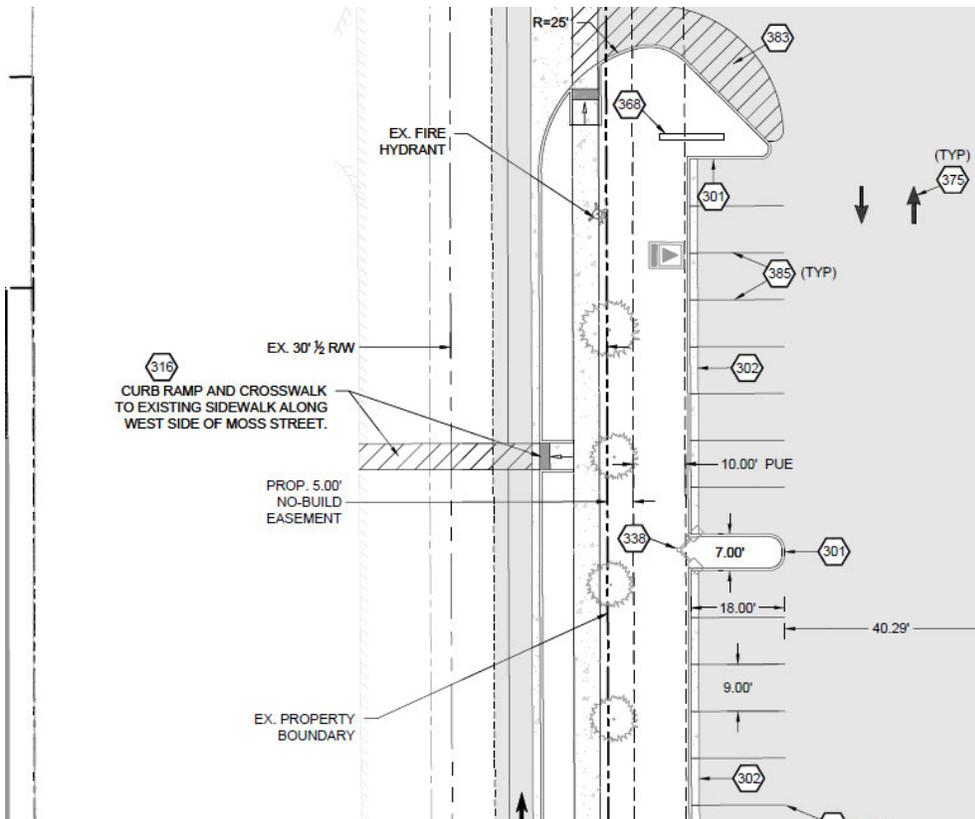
To address pedestrian safety, applicant will be constructing a pedestrian crosswalk across North Moss Street.
